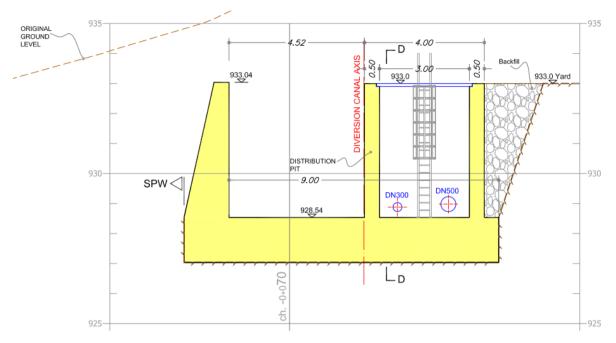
Powerhouse – Vertical Cross-section (Section E) (Studio Pietrangeli, 2019)
